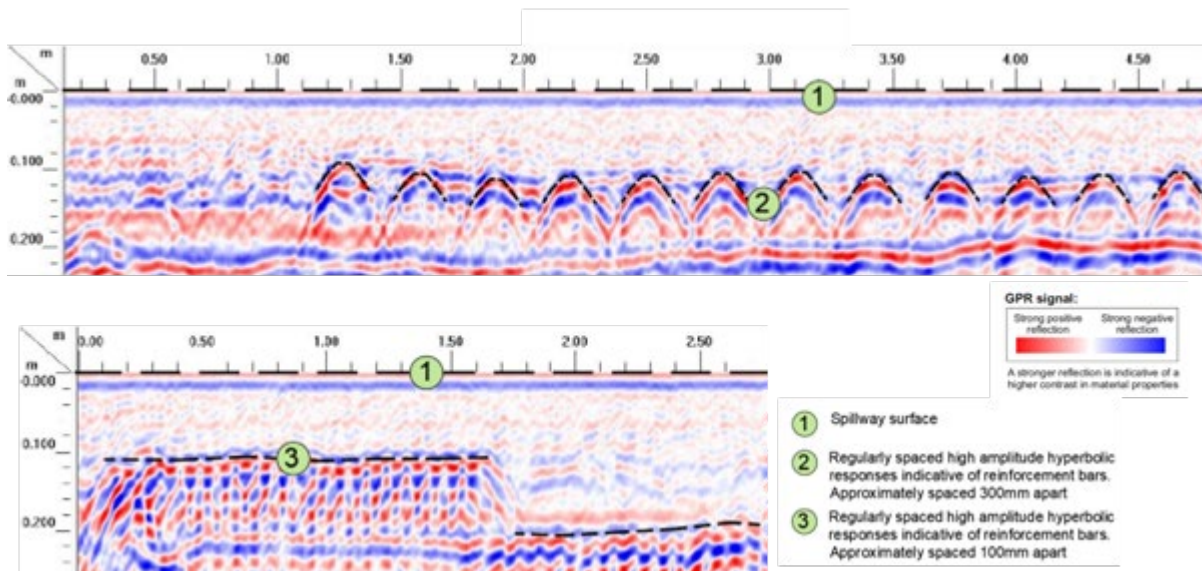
A 1.5GHz GPR deployed on a concrete spillway
